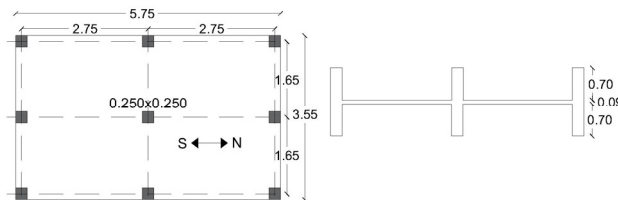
Specimen geometry - Single flat-slab floor [12] (m).
